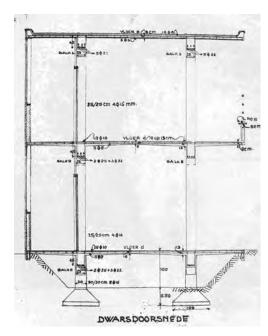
The double T-beam construction in Zonnestraal. Section through a pavilion. NB the contract drawings did not show yet the tapering of the floors.
